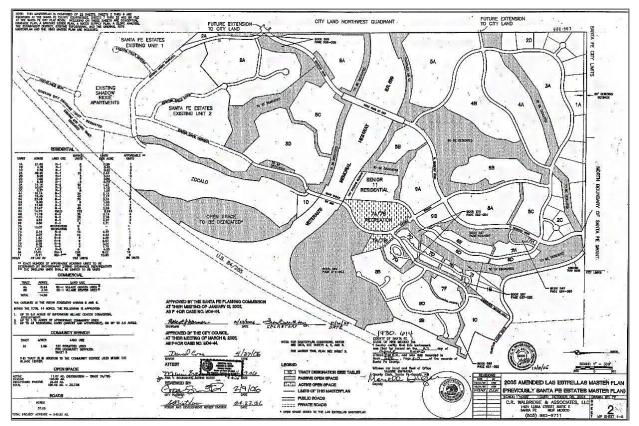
Las Estrellas Master Plan/ Open Space Dedication
